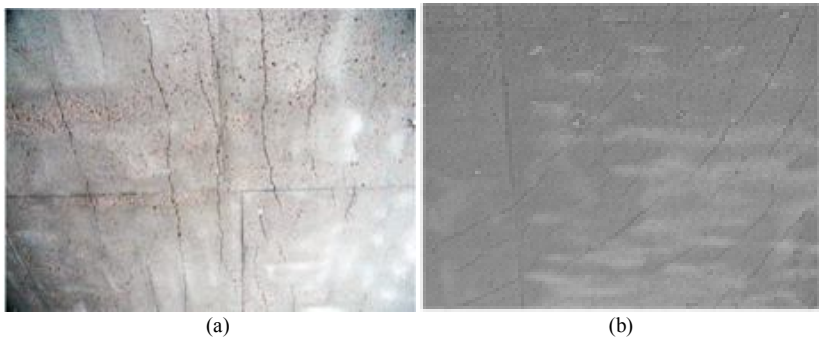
Cracks at the tension zone of reinforced concrete floor slabs:
